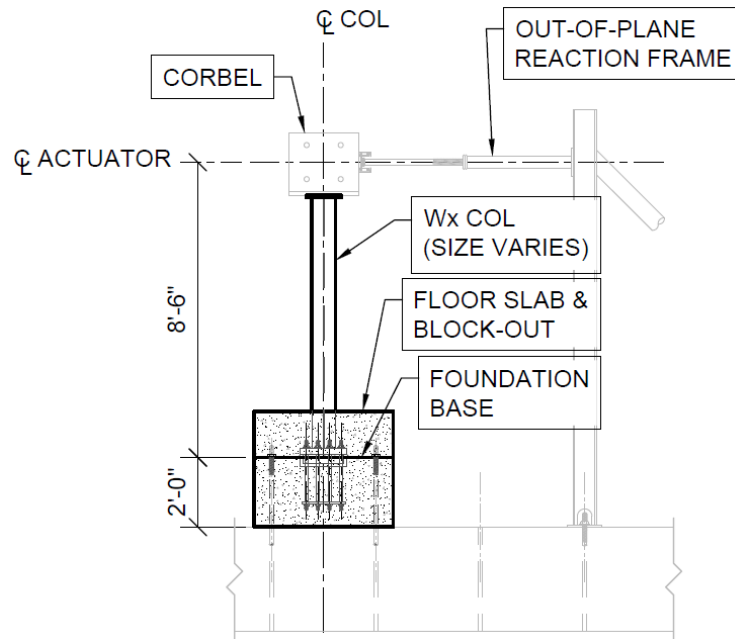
Test Setup General Layout - Elevation View Parallel to Loading
